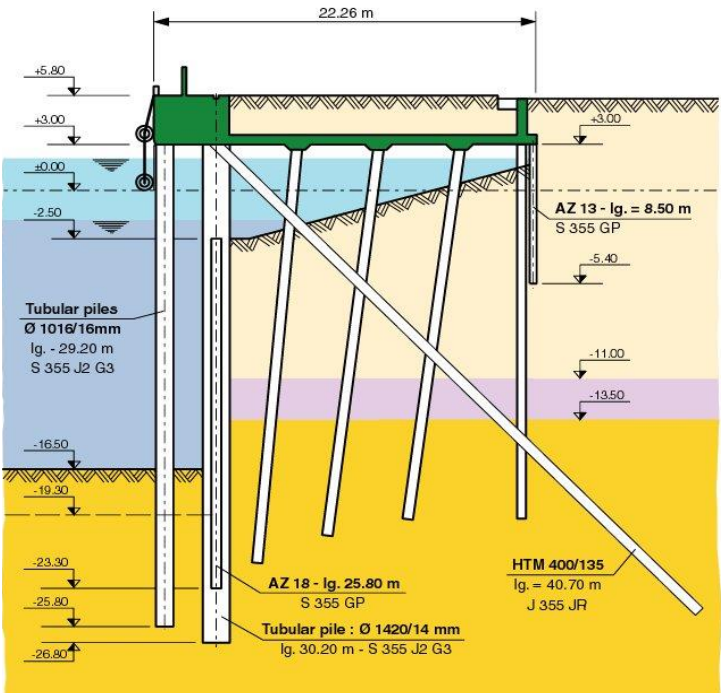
Typical harbour wall or quay wall construction; for other construction types see Figure 7.
